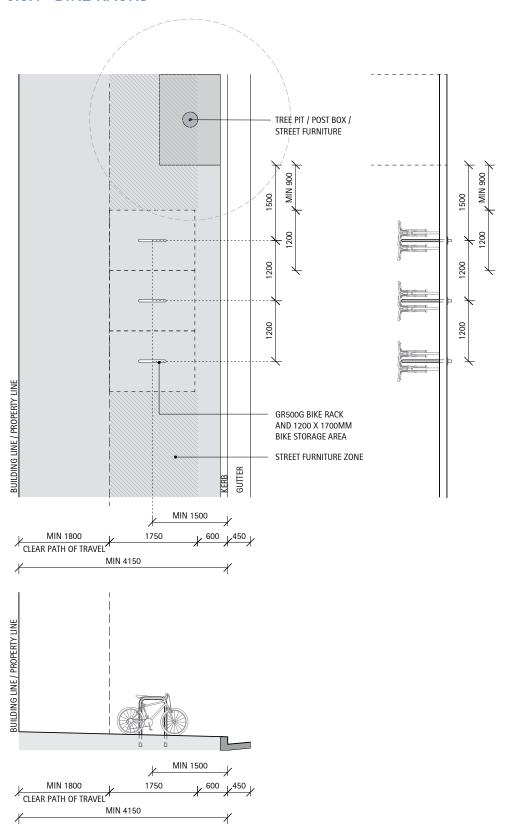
Bike rack layout option A - most preferred for CBD, Centres and any wider footpaths
